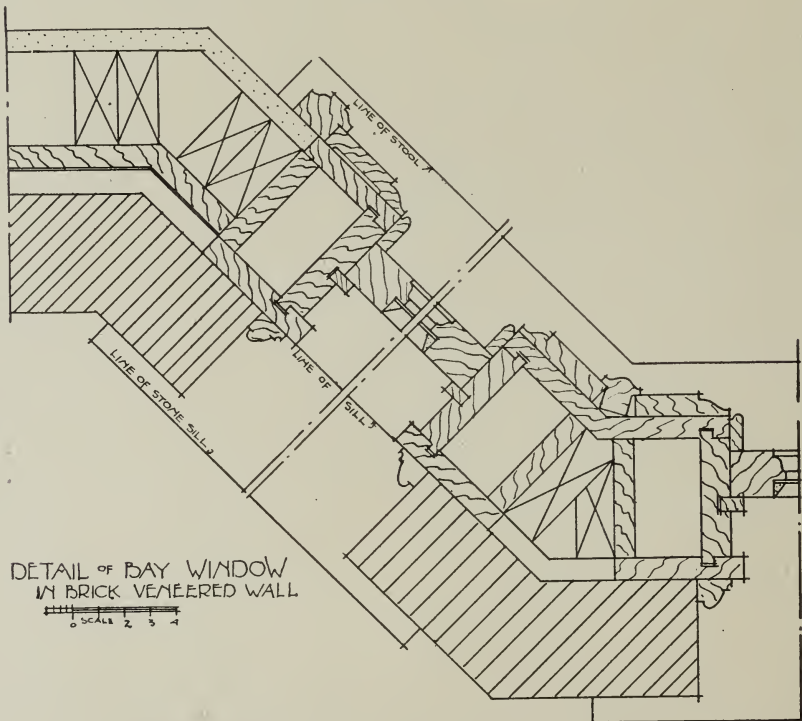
Detail of Bay-window in Brick-veneered Wall.
